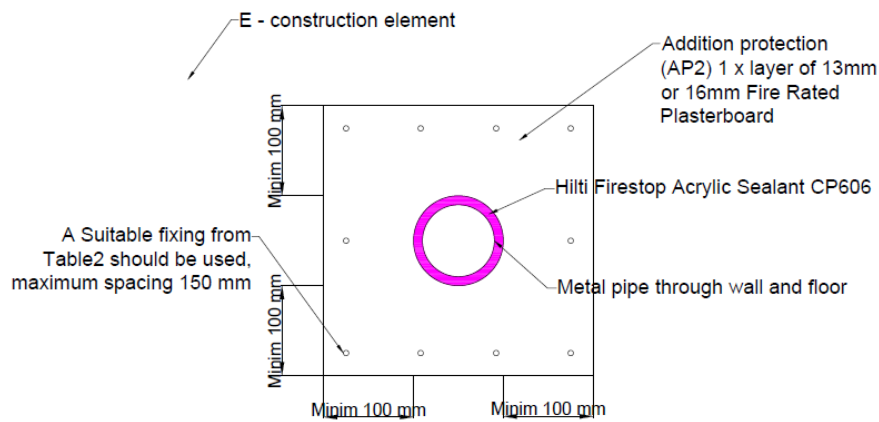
Figure C – Elevation of aperture framing / beading and position of the seal in walls
